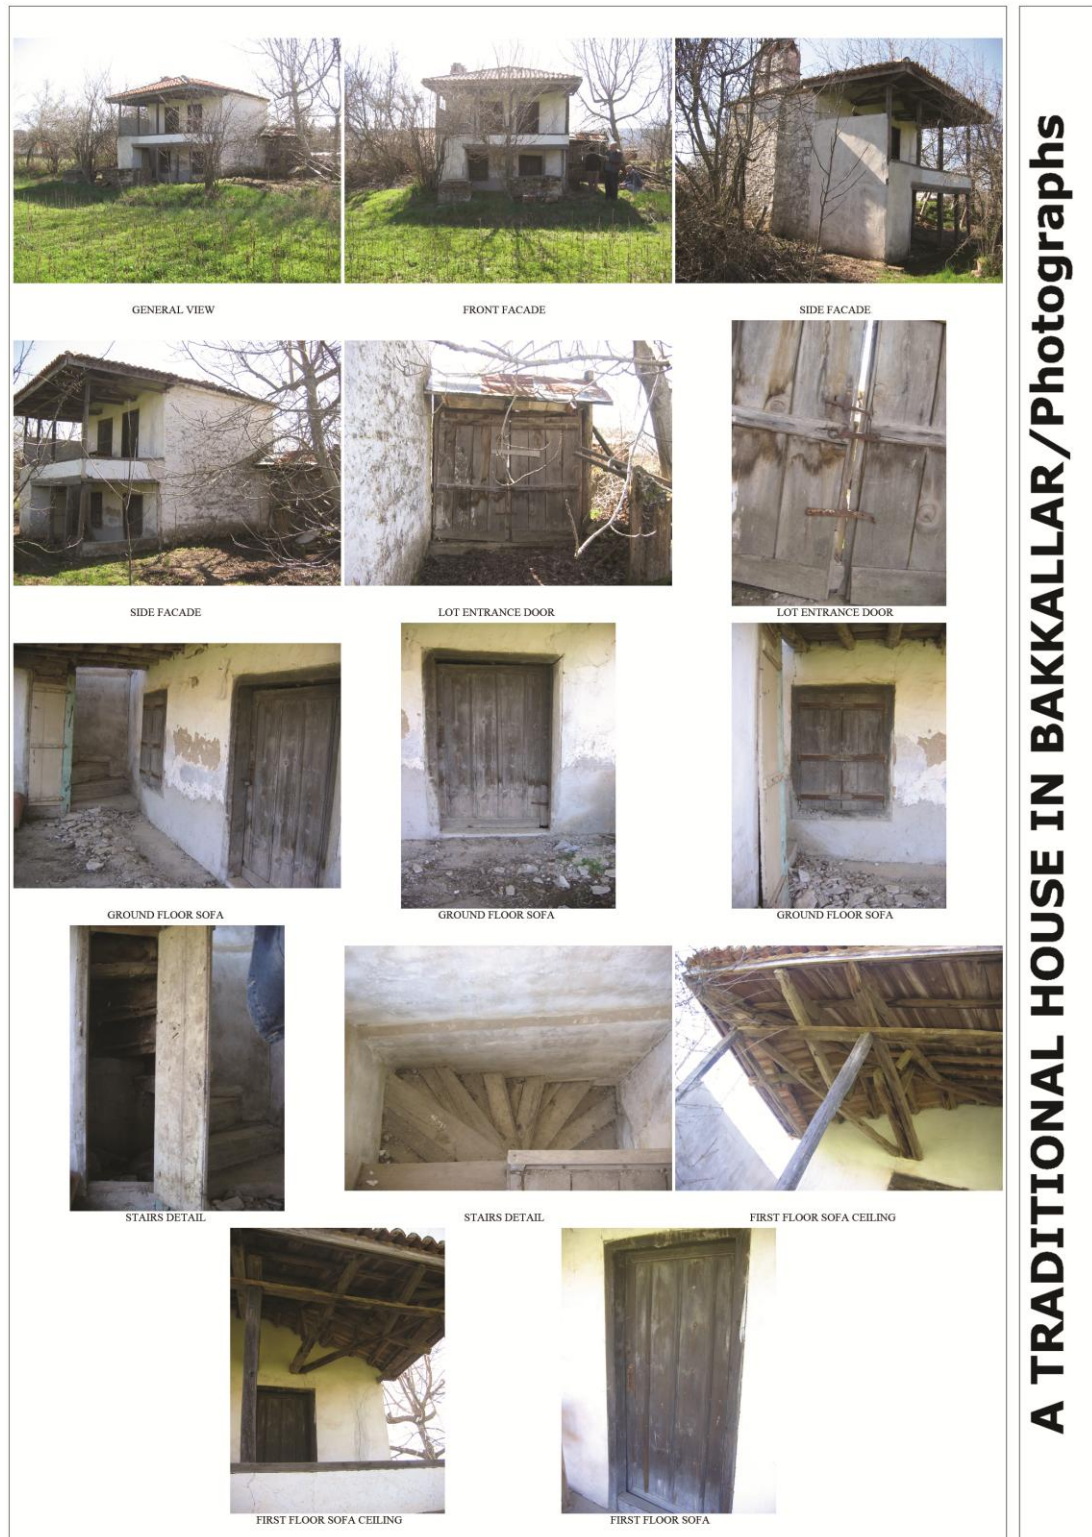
Photographs of a traditional dwelling in Bakkallar Neighborhood (Author, March 2008)
